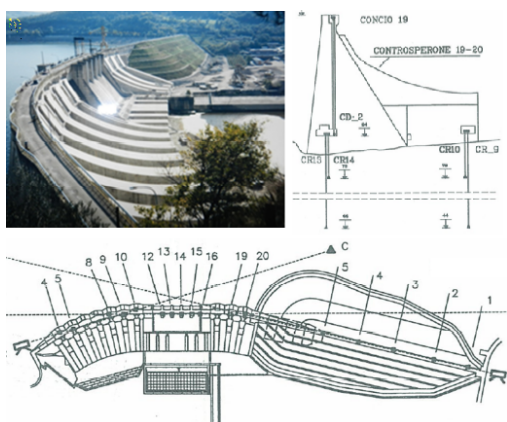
a)View of the Corbara dam. b) Central section. c) Plan
